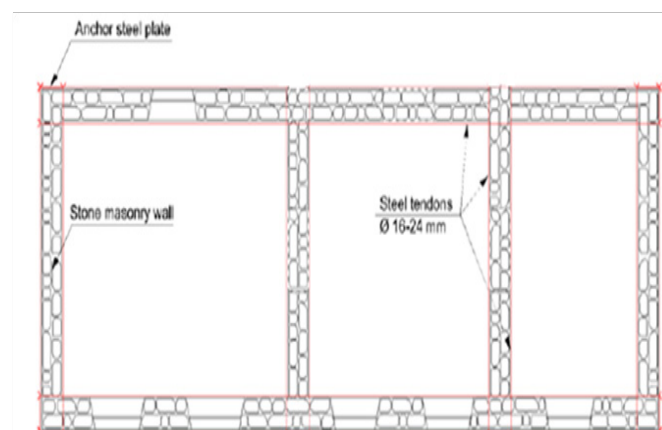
Distribution of horizontal ties in the plan for reinforcing stone masonry
